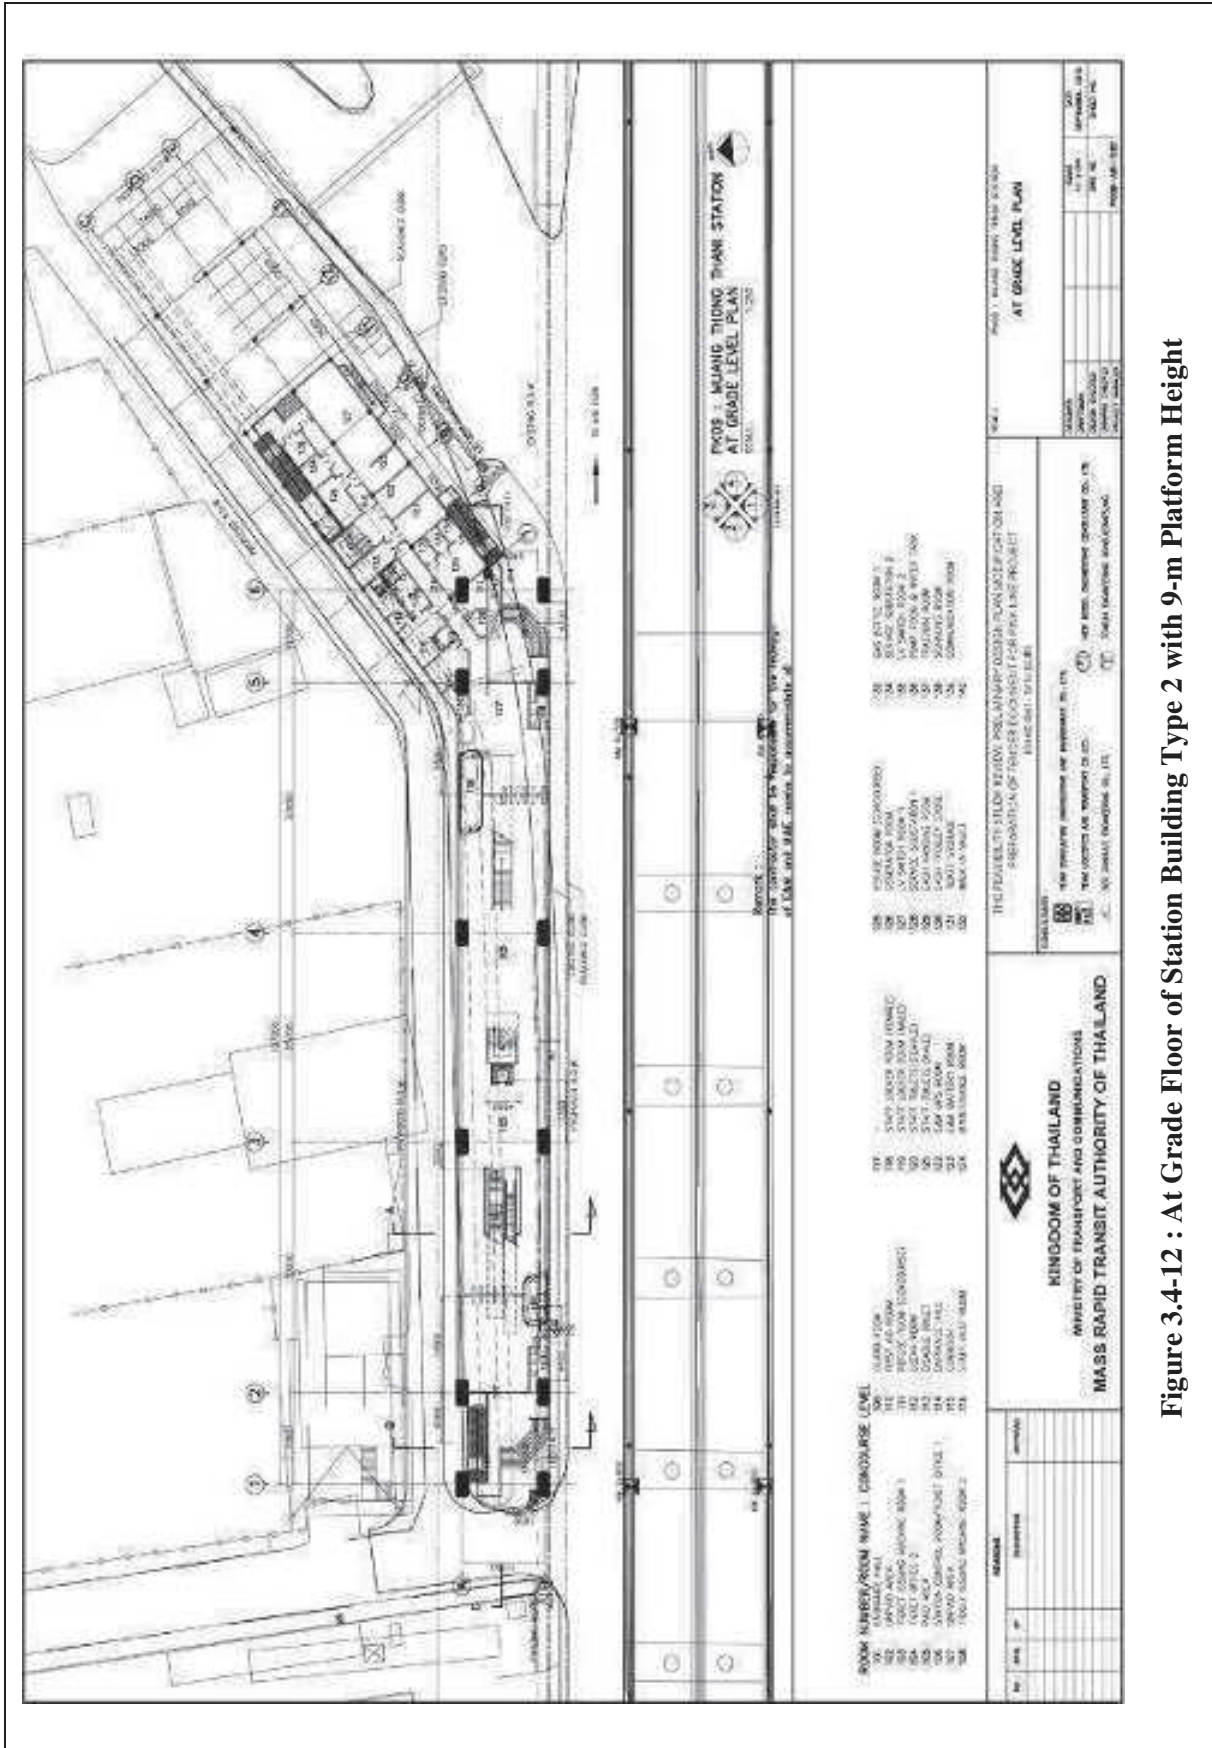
At Grade Floor of Station Building Type 2 with 9-m Platform Height
